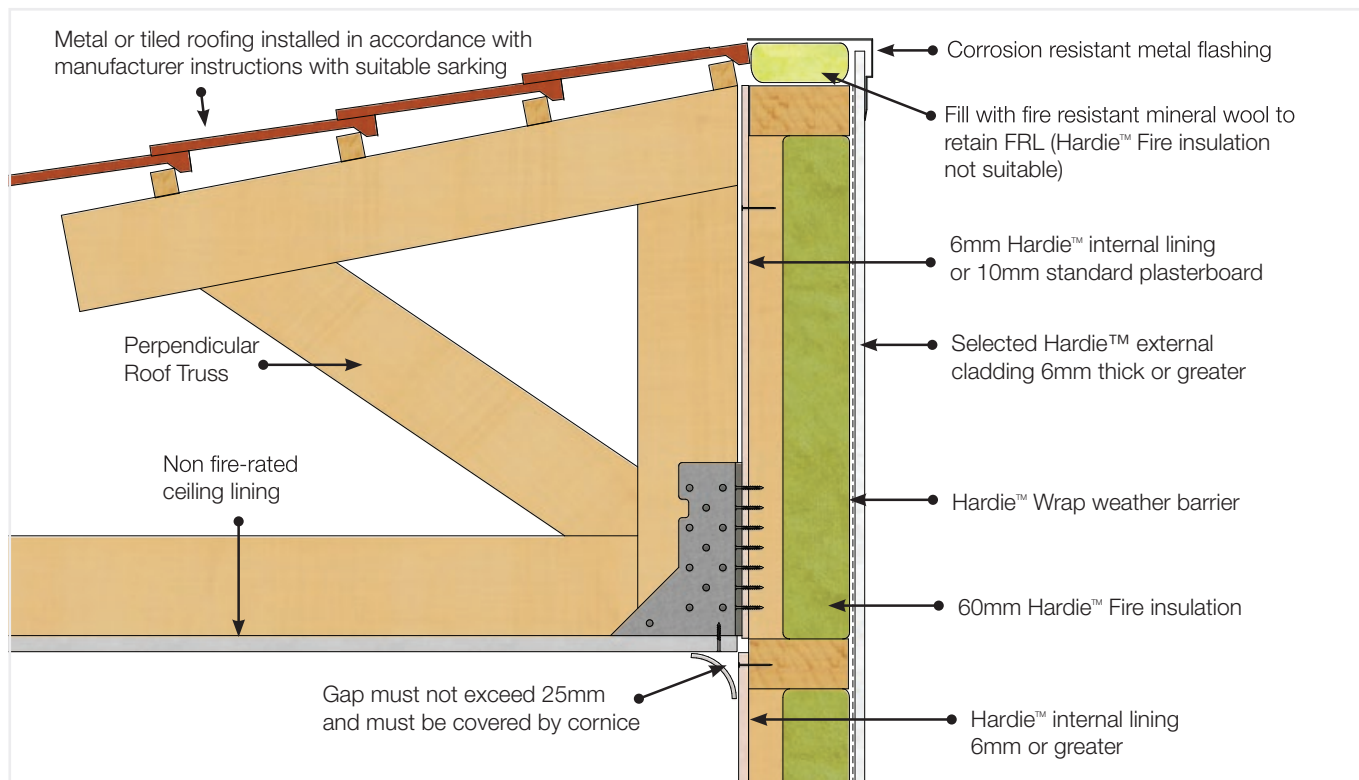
EXTERNAL BOUNDARY WALL TO PARAPET ROOF WITH PERPENDICULAR ROOF TRUSSES
